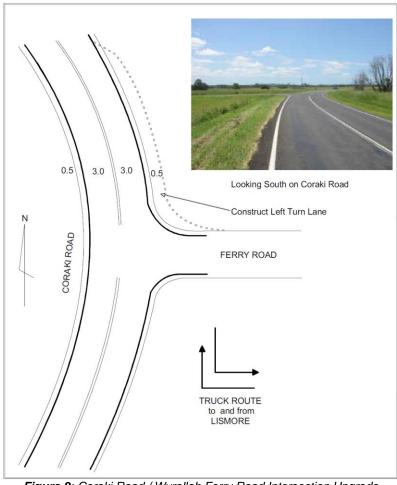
Coraki Road / Wyrallah Ferry Road Intersection Upgrade
